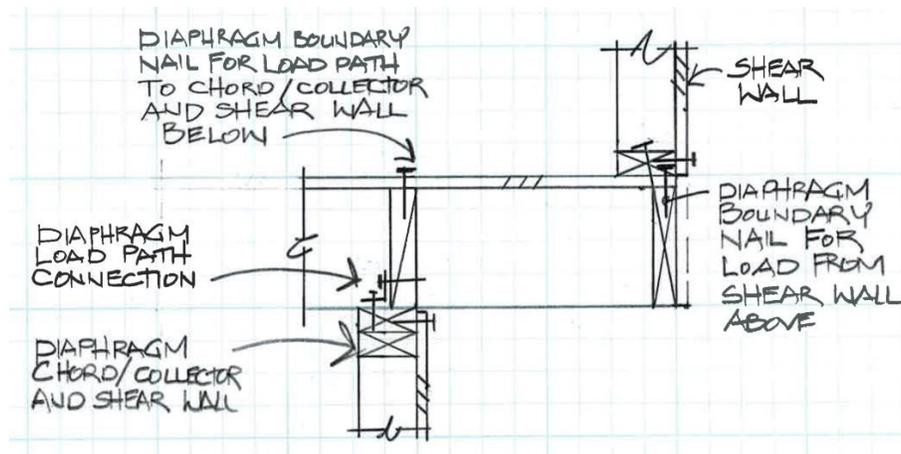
Diaphragm detail showing load path from shear wall above diaphragm to chord or collector
